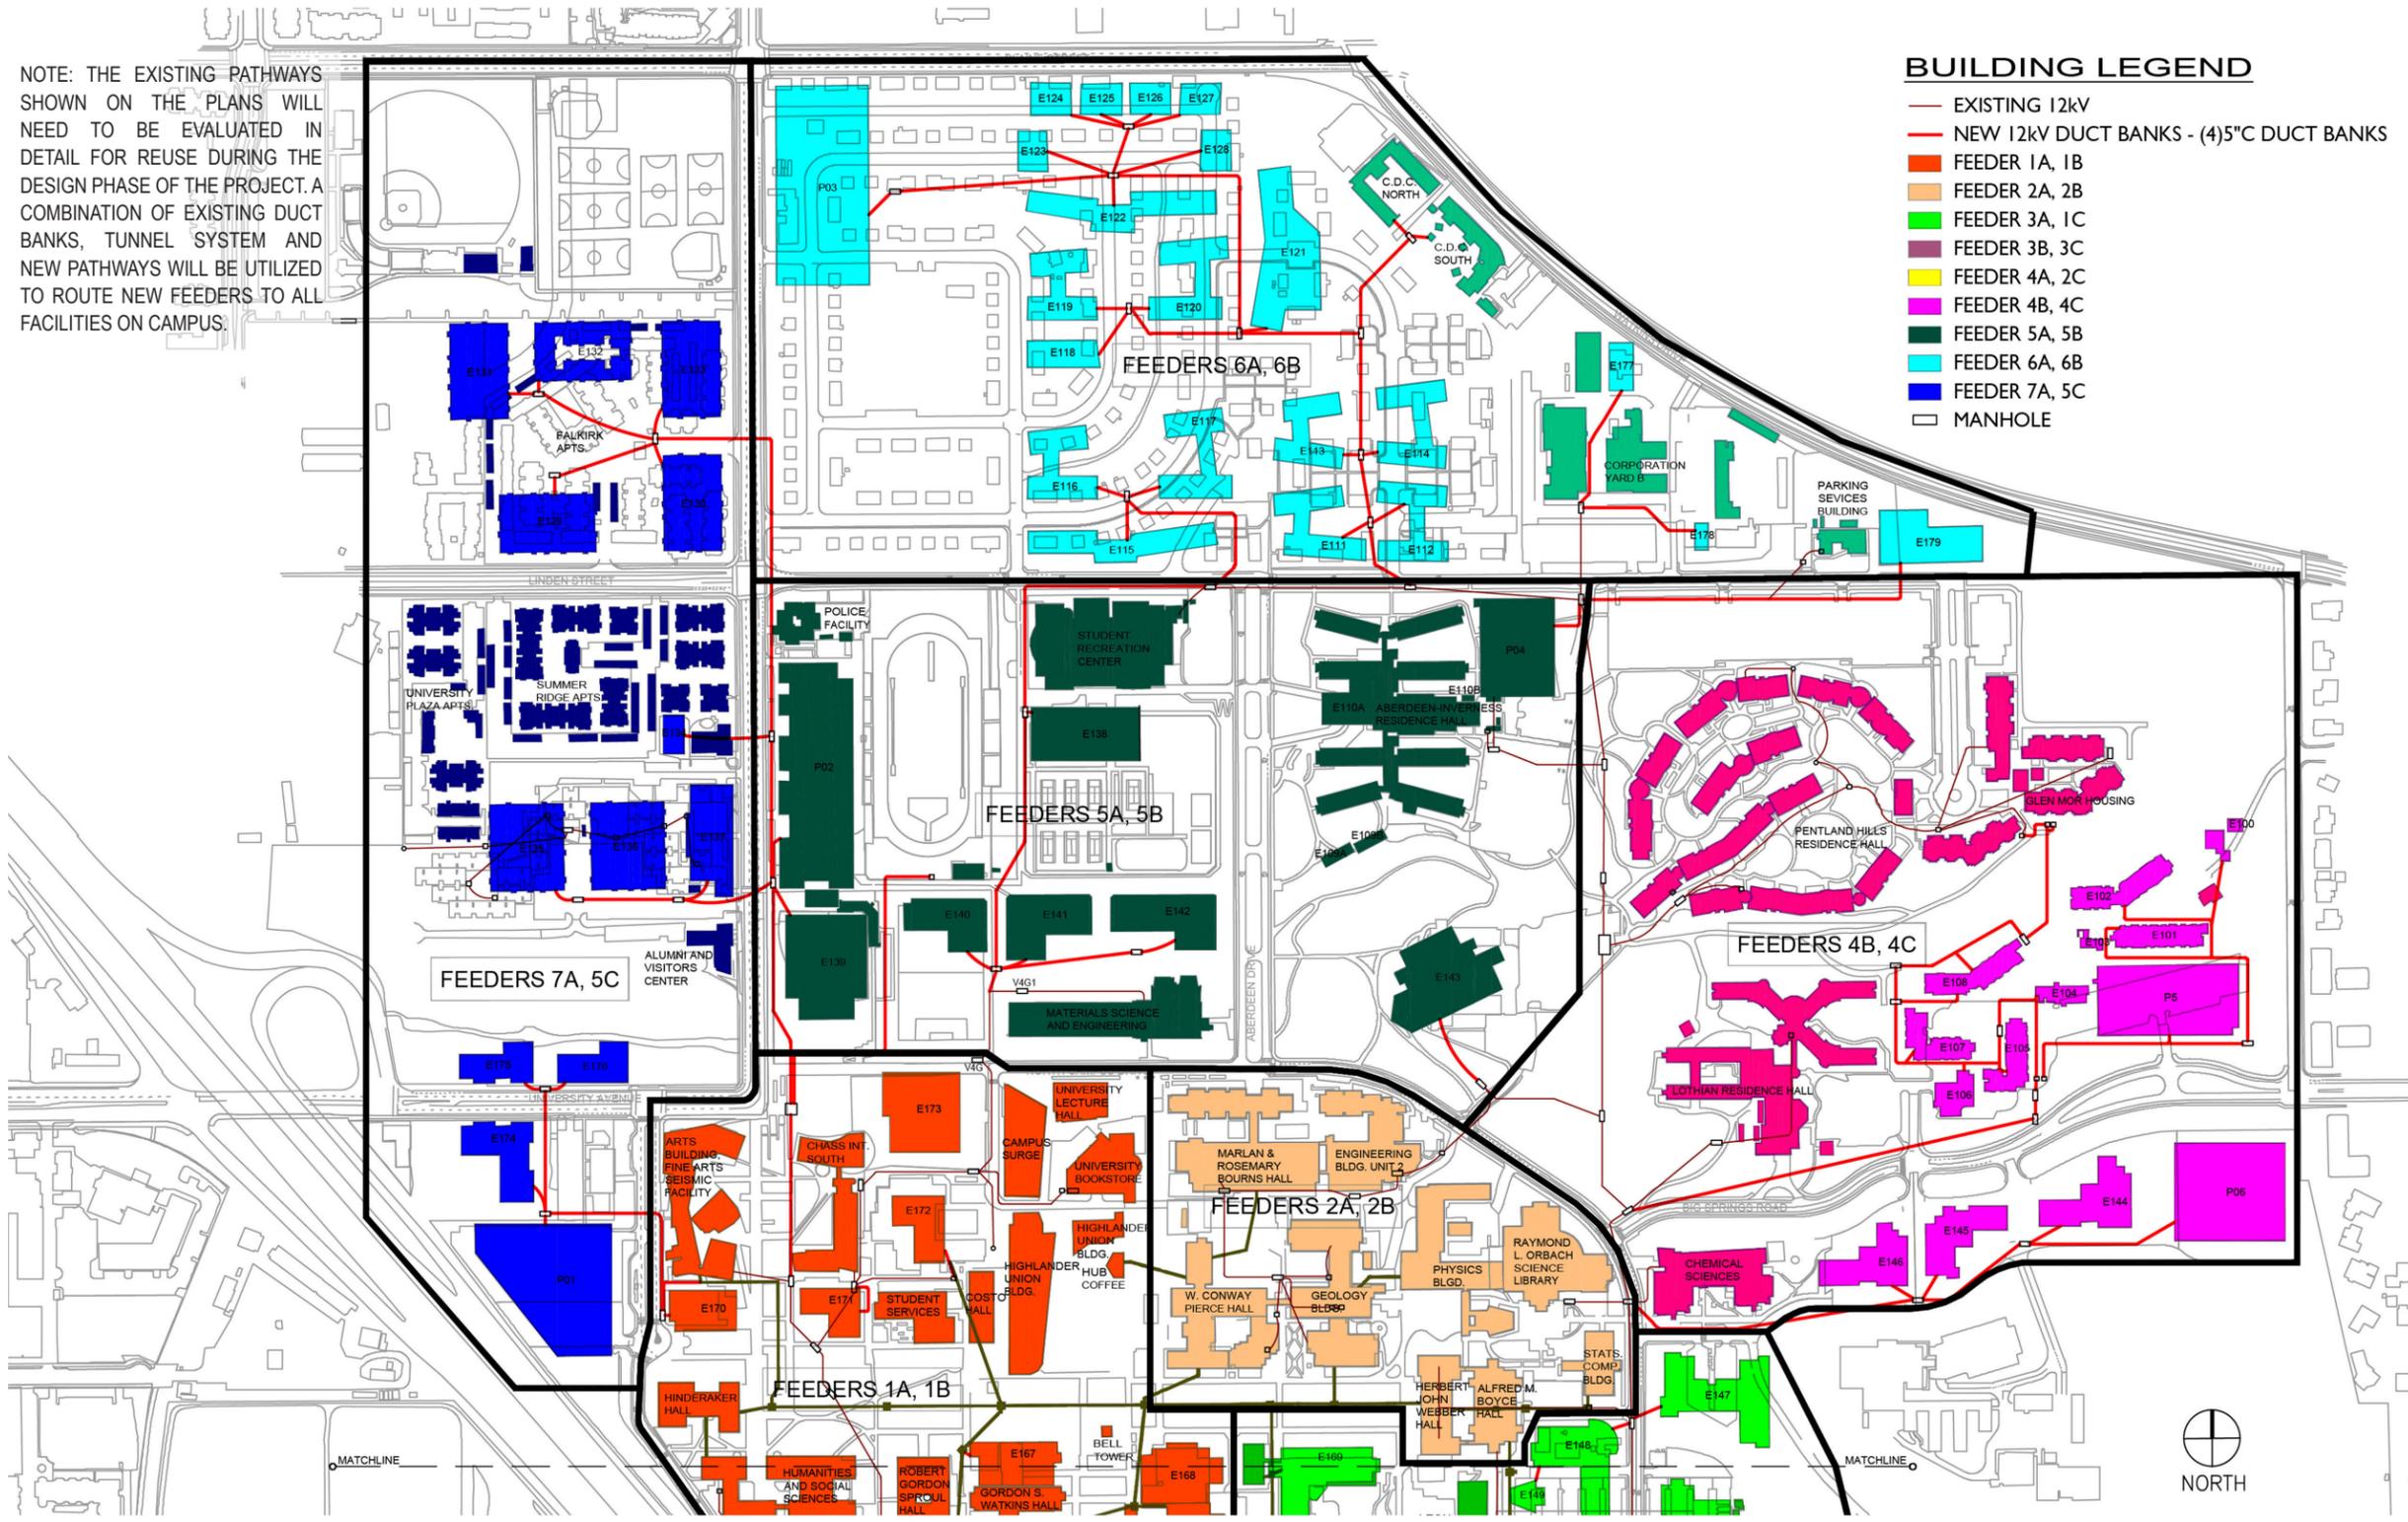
Medium Voltage Feeders Allocation Site Plan—North
